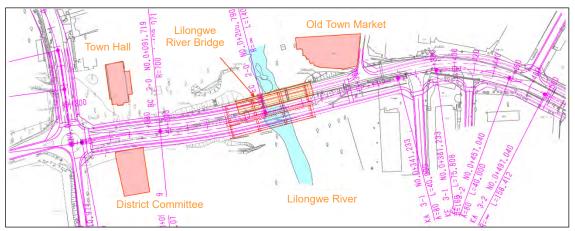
Location of a New Bridge and Road Alignment around the Bridge
